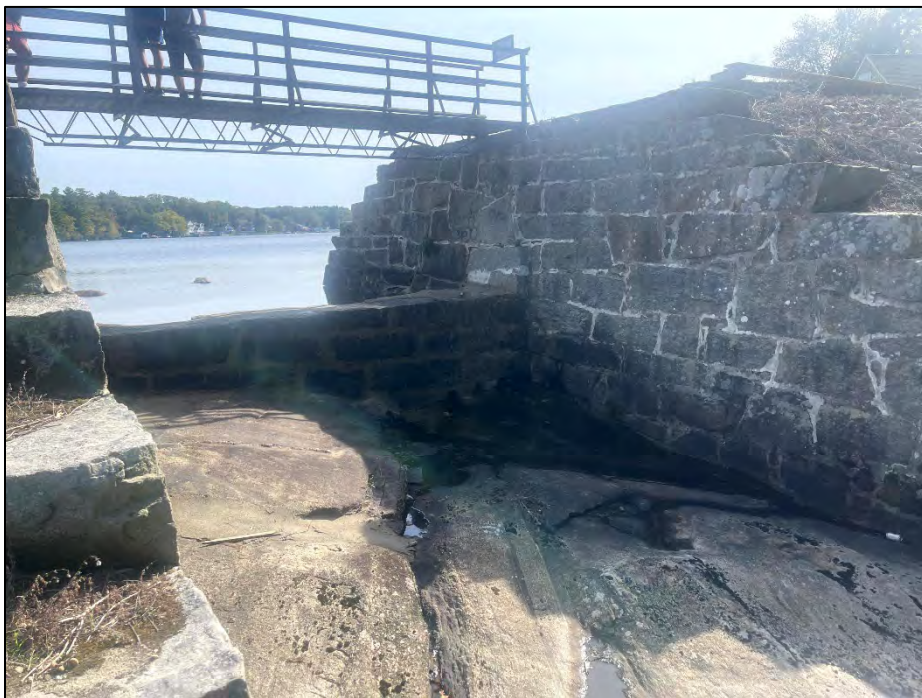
Overview of primary spillway as viewed from downstream looking upstream and slightly left, including the spillway's left wall, the weir wall, and catwalk.
